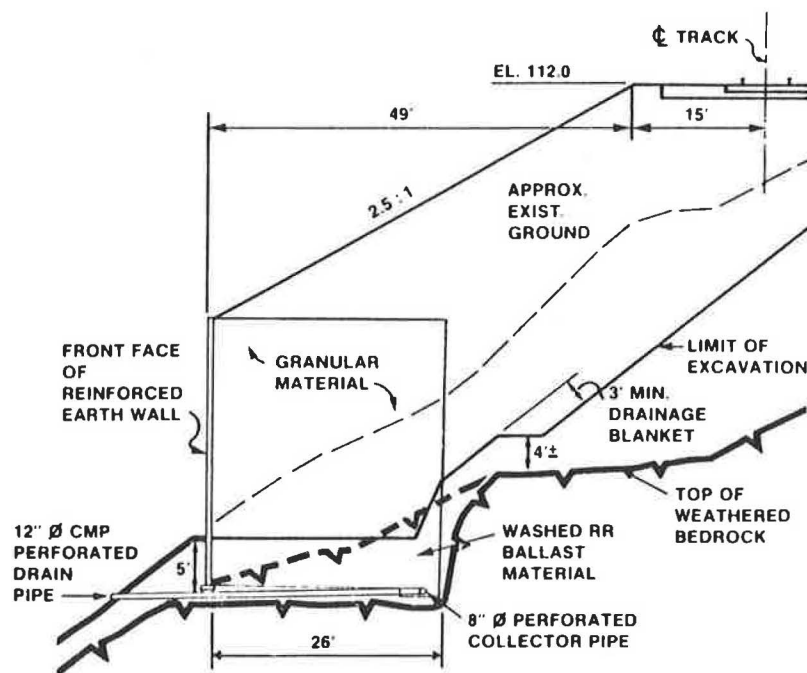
Typical cross section of Clinchfield stabilization project.
